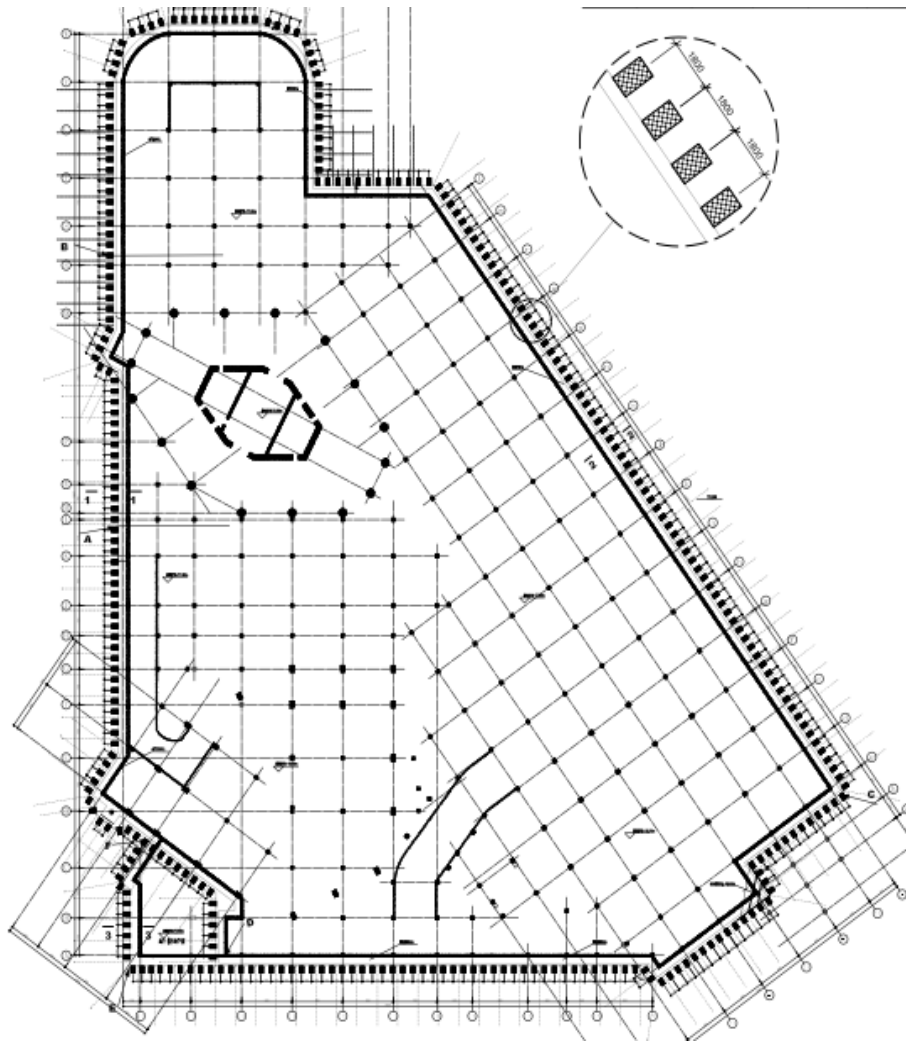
Site layout for the Commercial Bank of Ethiopia New Headquarter Building
